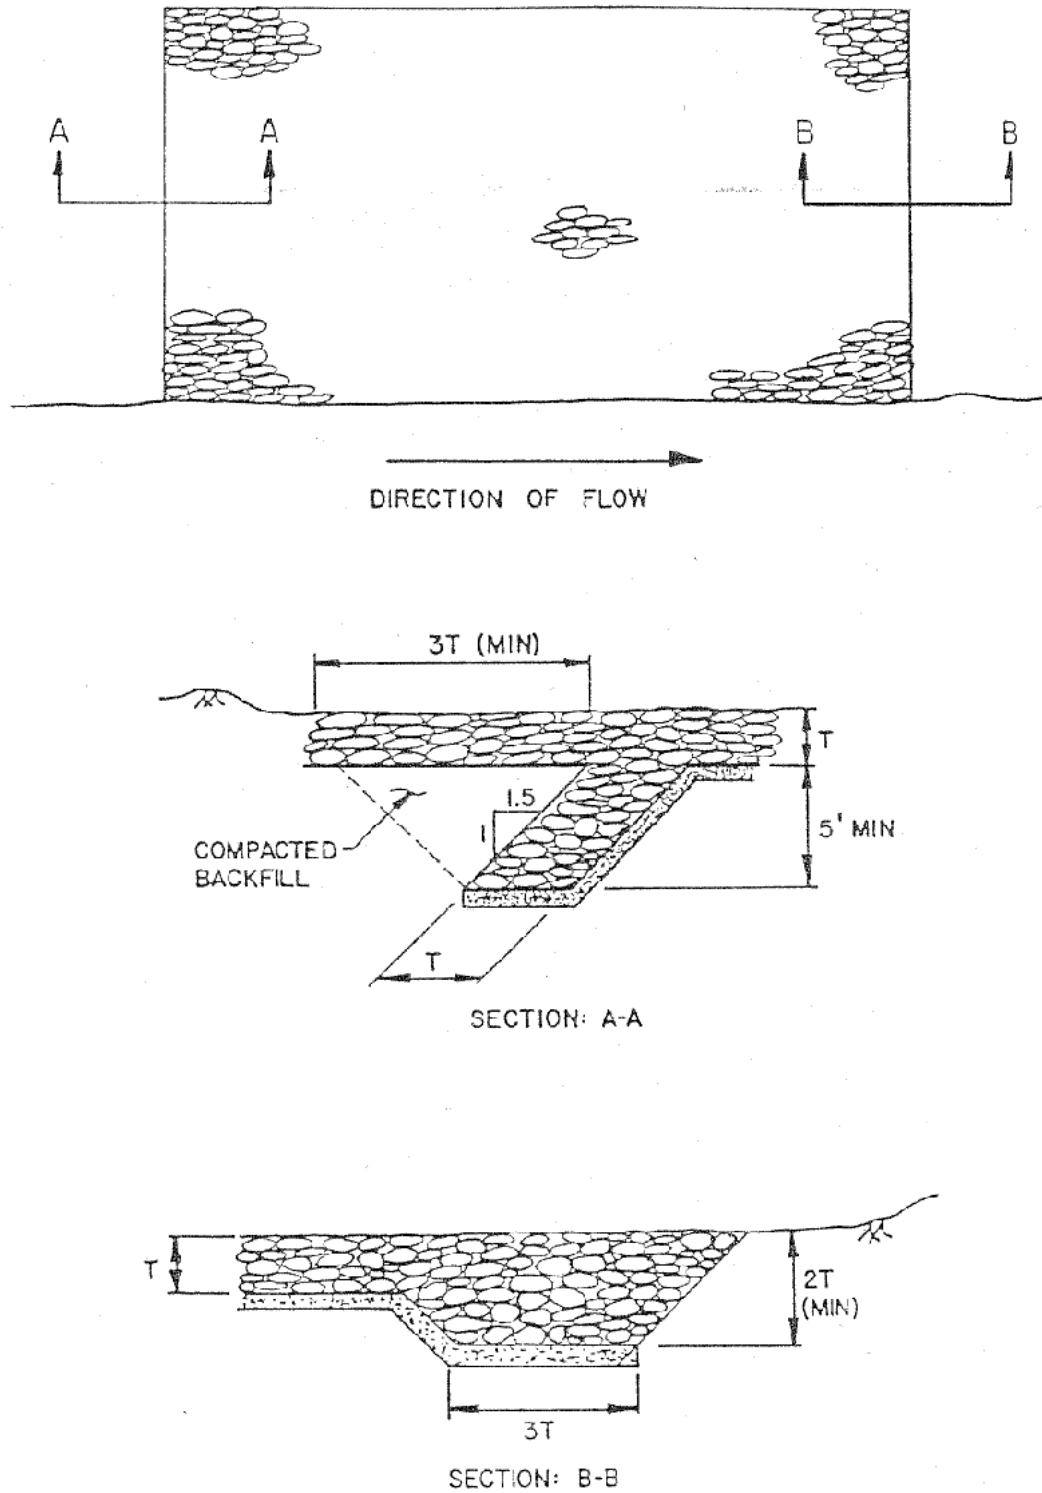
Typical Riprap Installation: Plan And Flank Details
